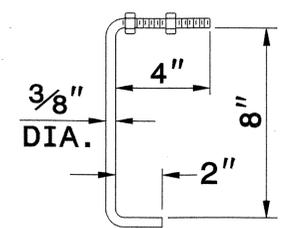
DETAIL SHOWING ANCHORAGE OF FRAME FOR GRATED DROP INLET
